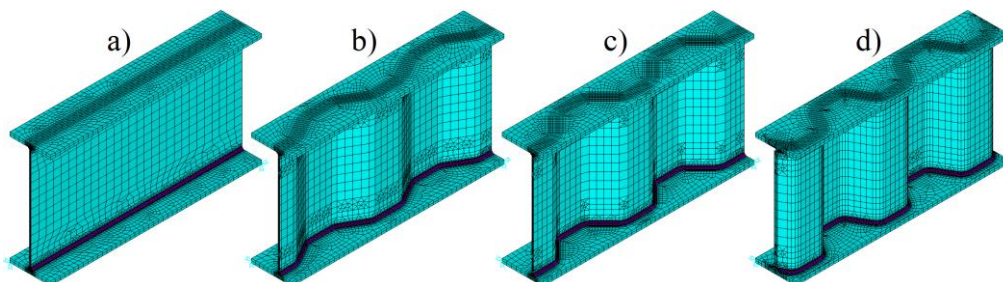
Finite element model of a) a conventional girder with I-shaped cross section and girders with corrugation angles of b) 30°, c) 45° and d) 60°.
